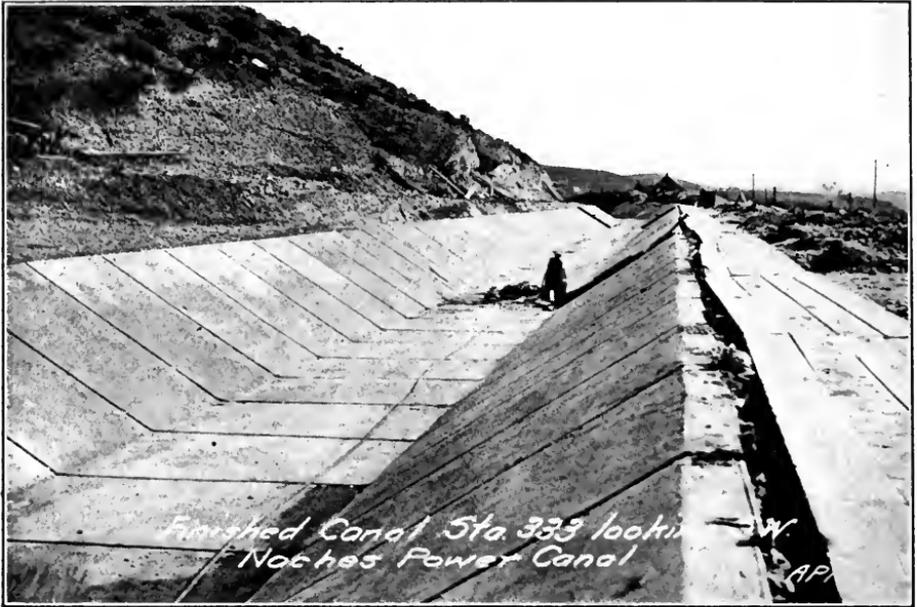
FIG. C.—Completed lining before filling contraction joints. Naches Power Canal, Wash.
